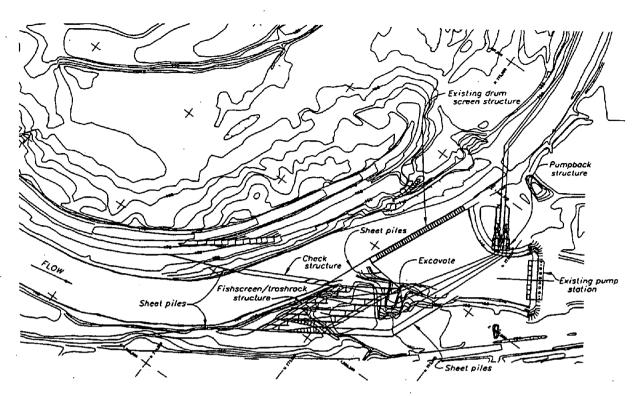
Conceptual layout: Plan view of proposed A alternative.
